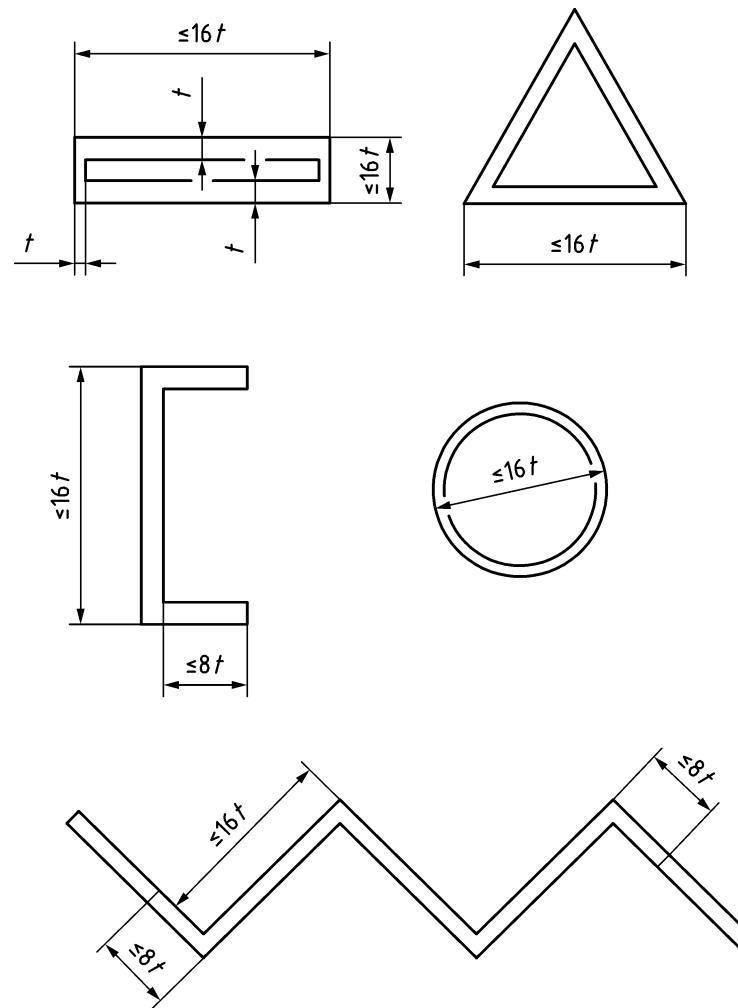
Examples of complex shaped members showing limitations on length of constituent walls
